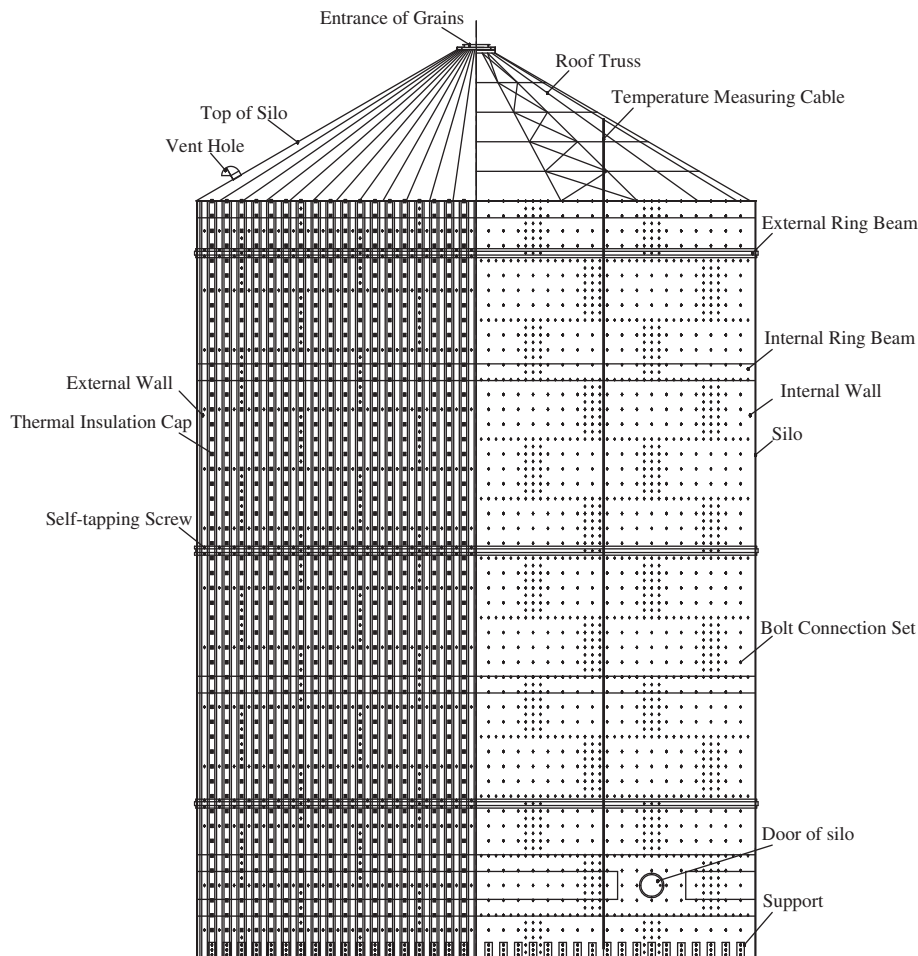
Double-wall steel insulation silo with multiple bolted joints.
